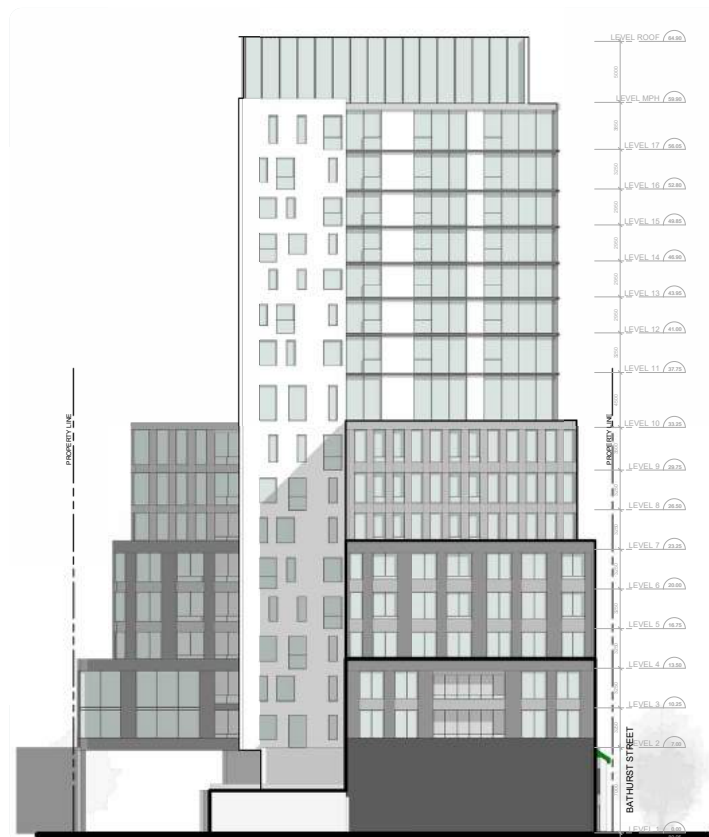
South Elevations (Prepared by Kirkor Architects)
